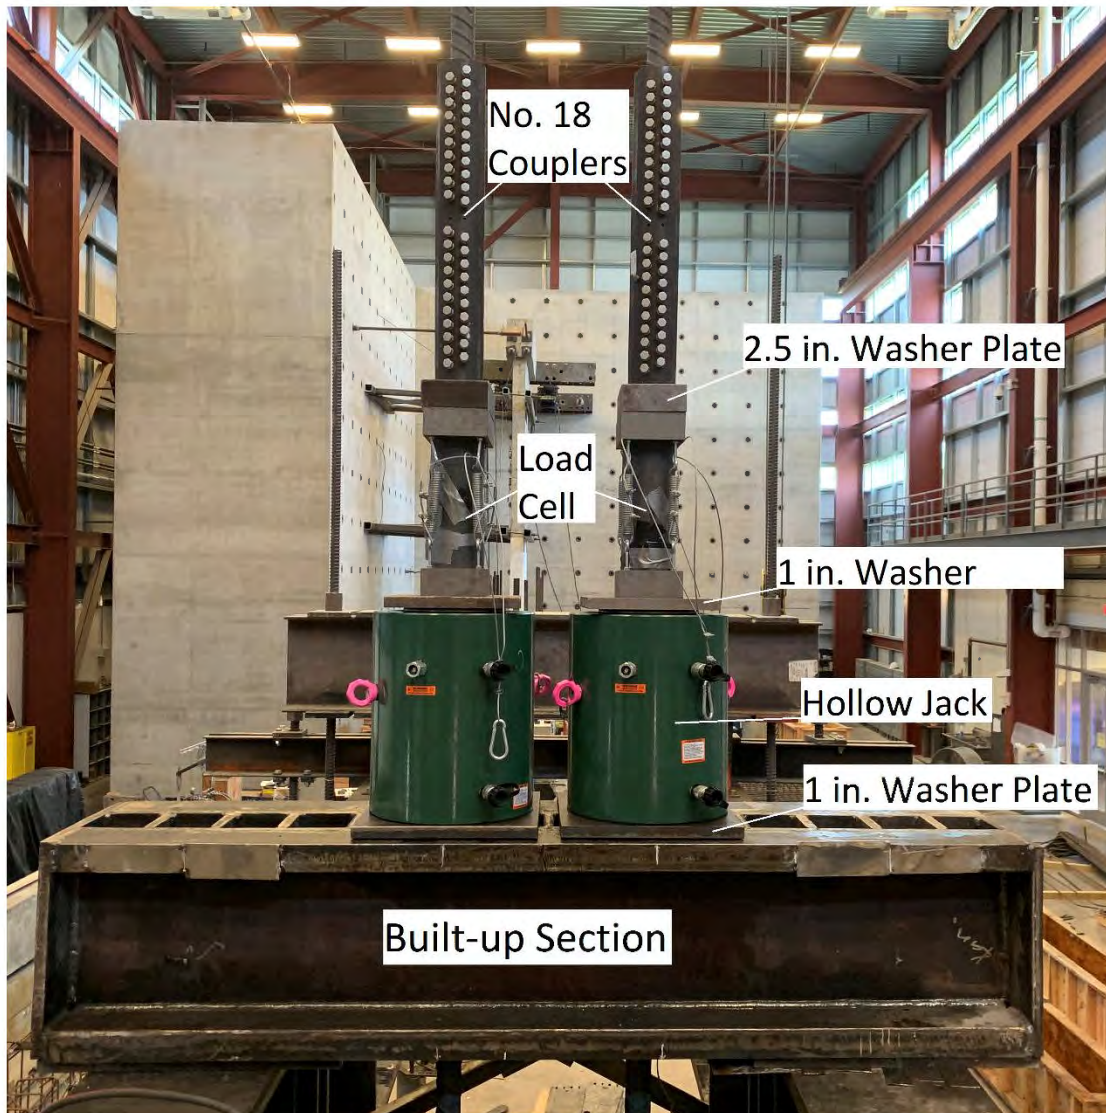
Alternative test setup used in widely-spaced No. 18 bar specimens
